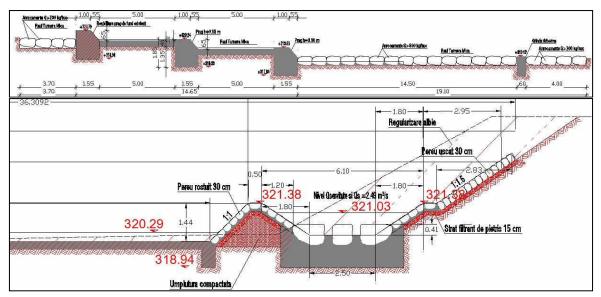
Longitudinal profile by the triple step arrangement and detail cross-section by the first concrete casted three-stone row on the fish passage
